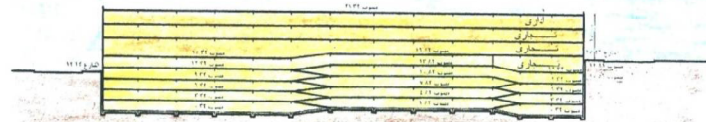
Longitudinal Section of Underground Garage at El Darrasa.
